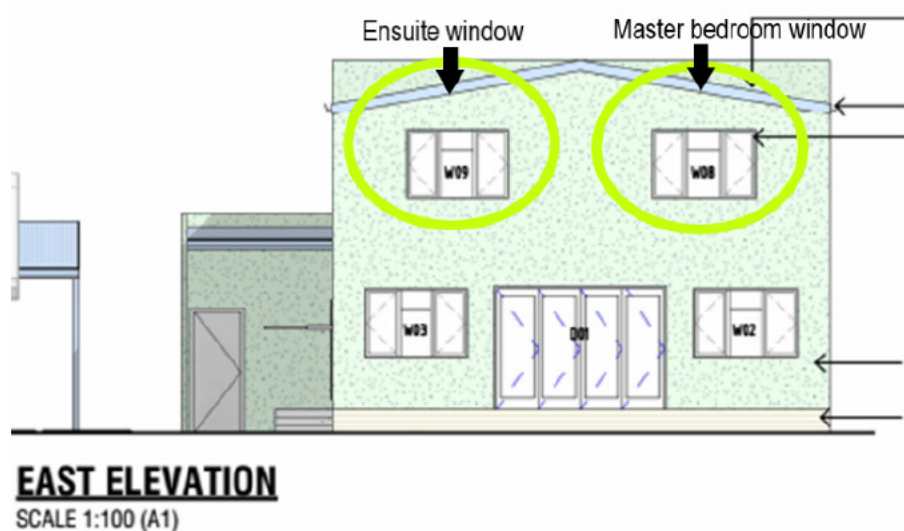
Eastern Elevation. Windows on the first floor adjoining neighbouring properties circled in neon green. Window No. W08 master bedroom & W09 ensuite.
